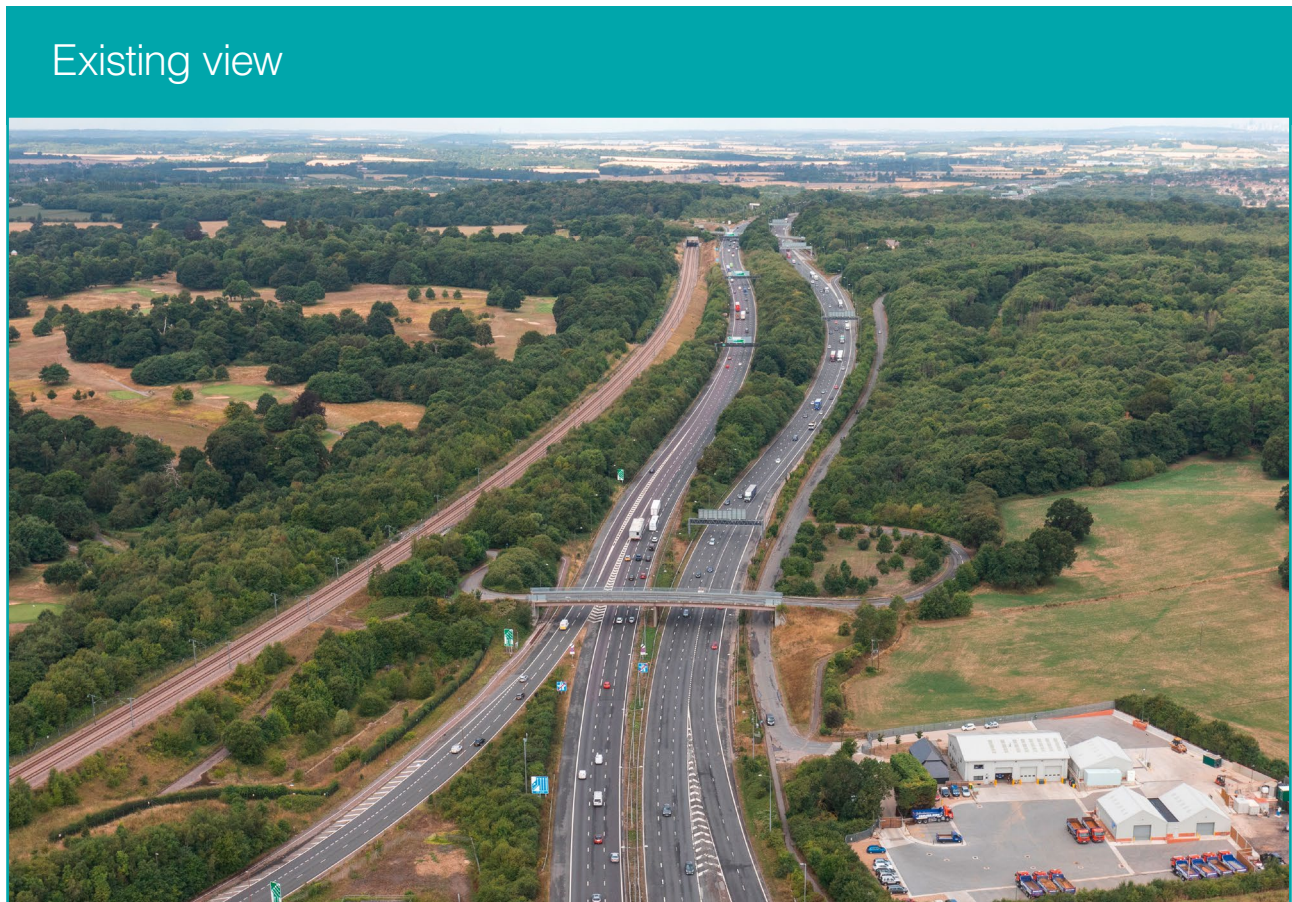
Existing M2/A2 along the A2 near Park Pale bridge, looking west
